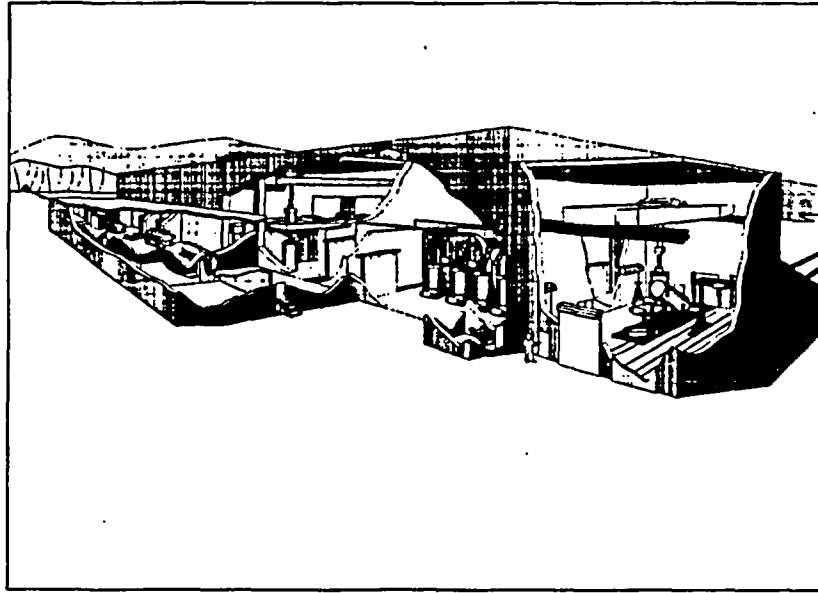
8. Cask Receipt and Waste Canister Unloading
